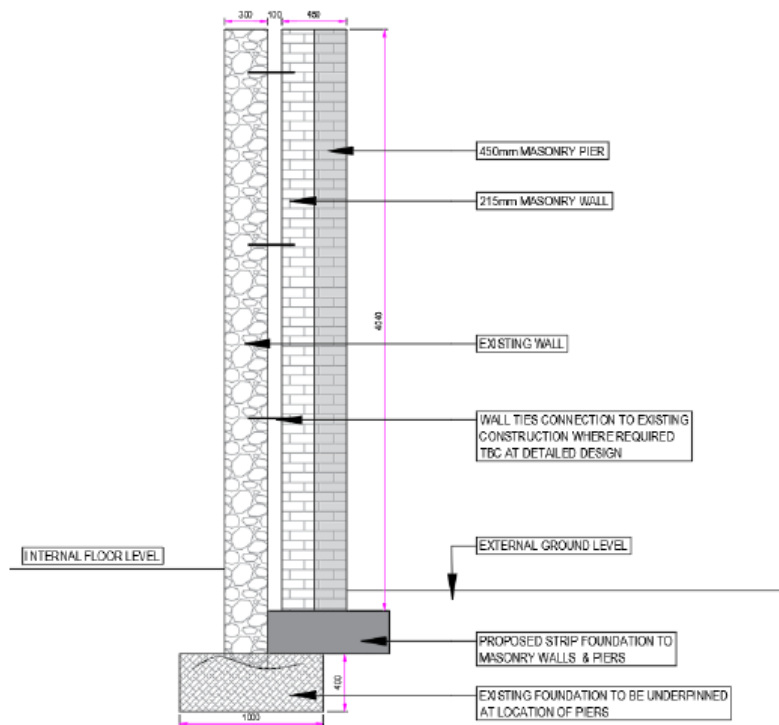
Section of the proposed masonry wall creating a new façade onto CGDP
